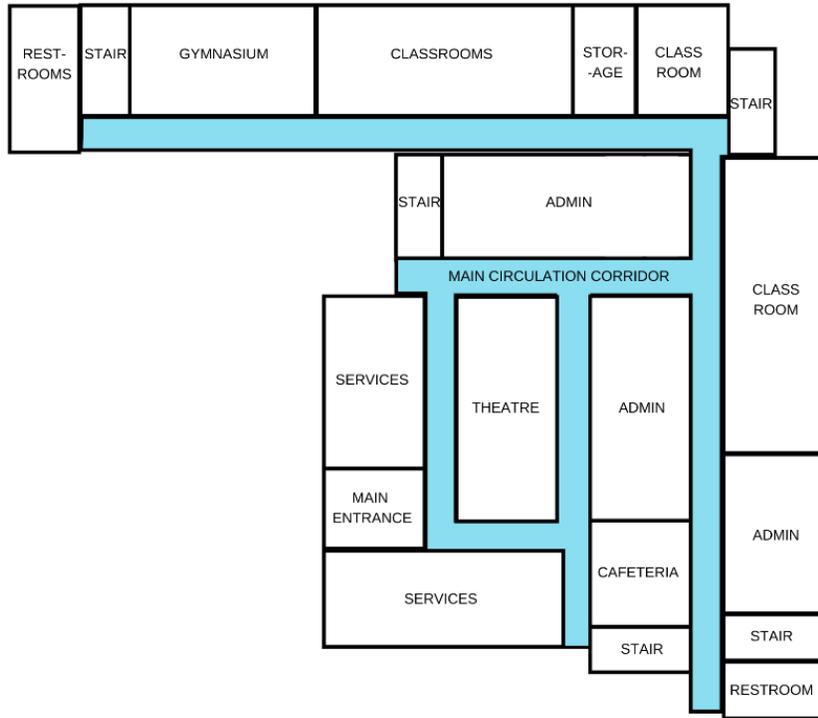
Egyptian Japanese School Building Layout Graphical Representation – 1st Floor (By: Author)
